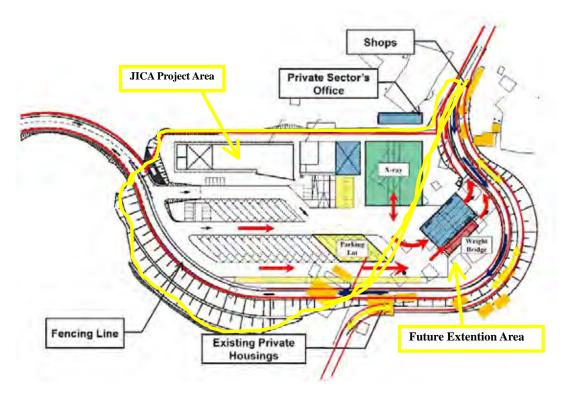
Plan for Future Expansion of the Tanzanian OSBP Facility Site
